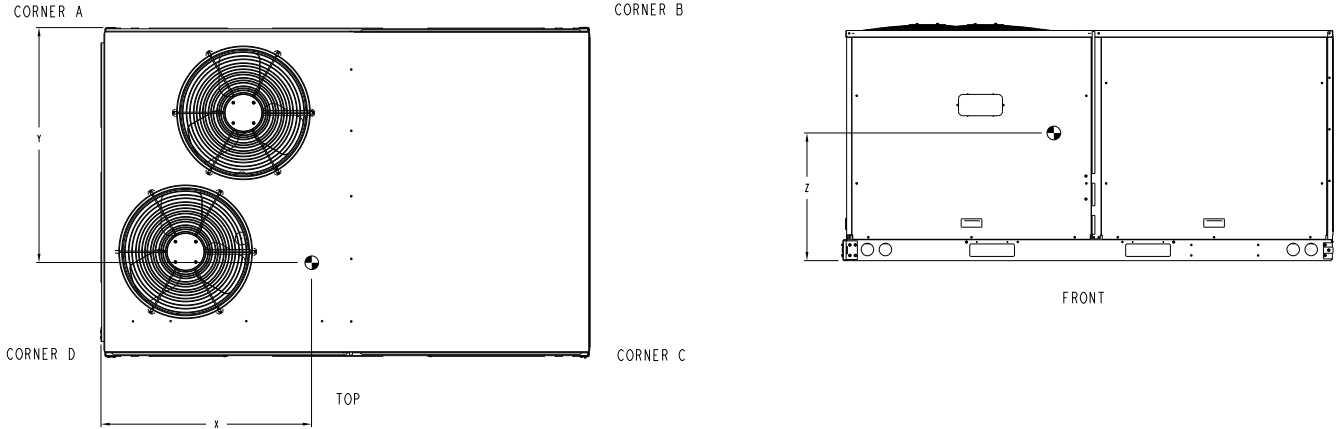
Dimensions RHH 072-090 (Sheet 1 of 2)
